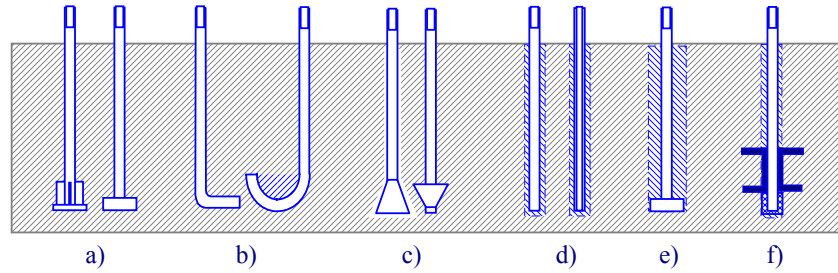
Types of anchor bolts, a) cast-in-situ headed anchor bolts, b) hooked bars, c) undercut anchor bolts, d) bonded anchor bolts, e) grouted anchor bolts, f) anchoring to grillage beams
